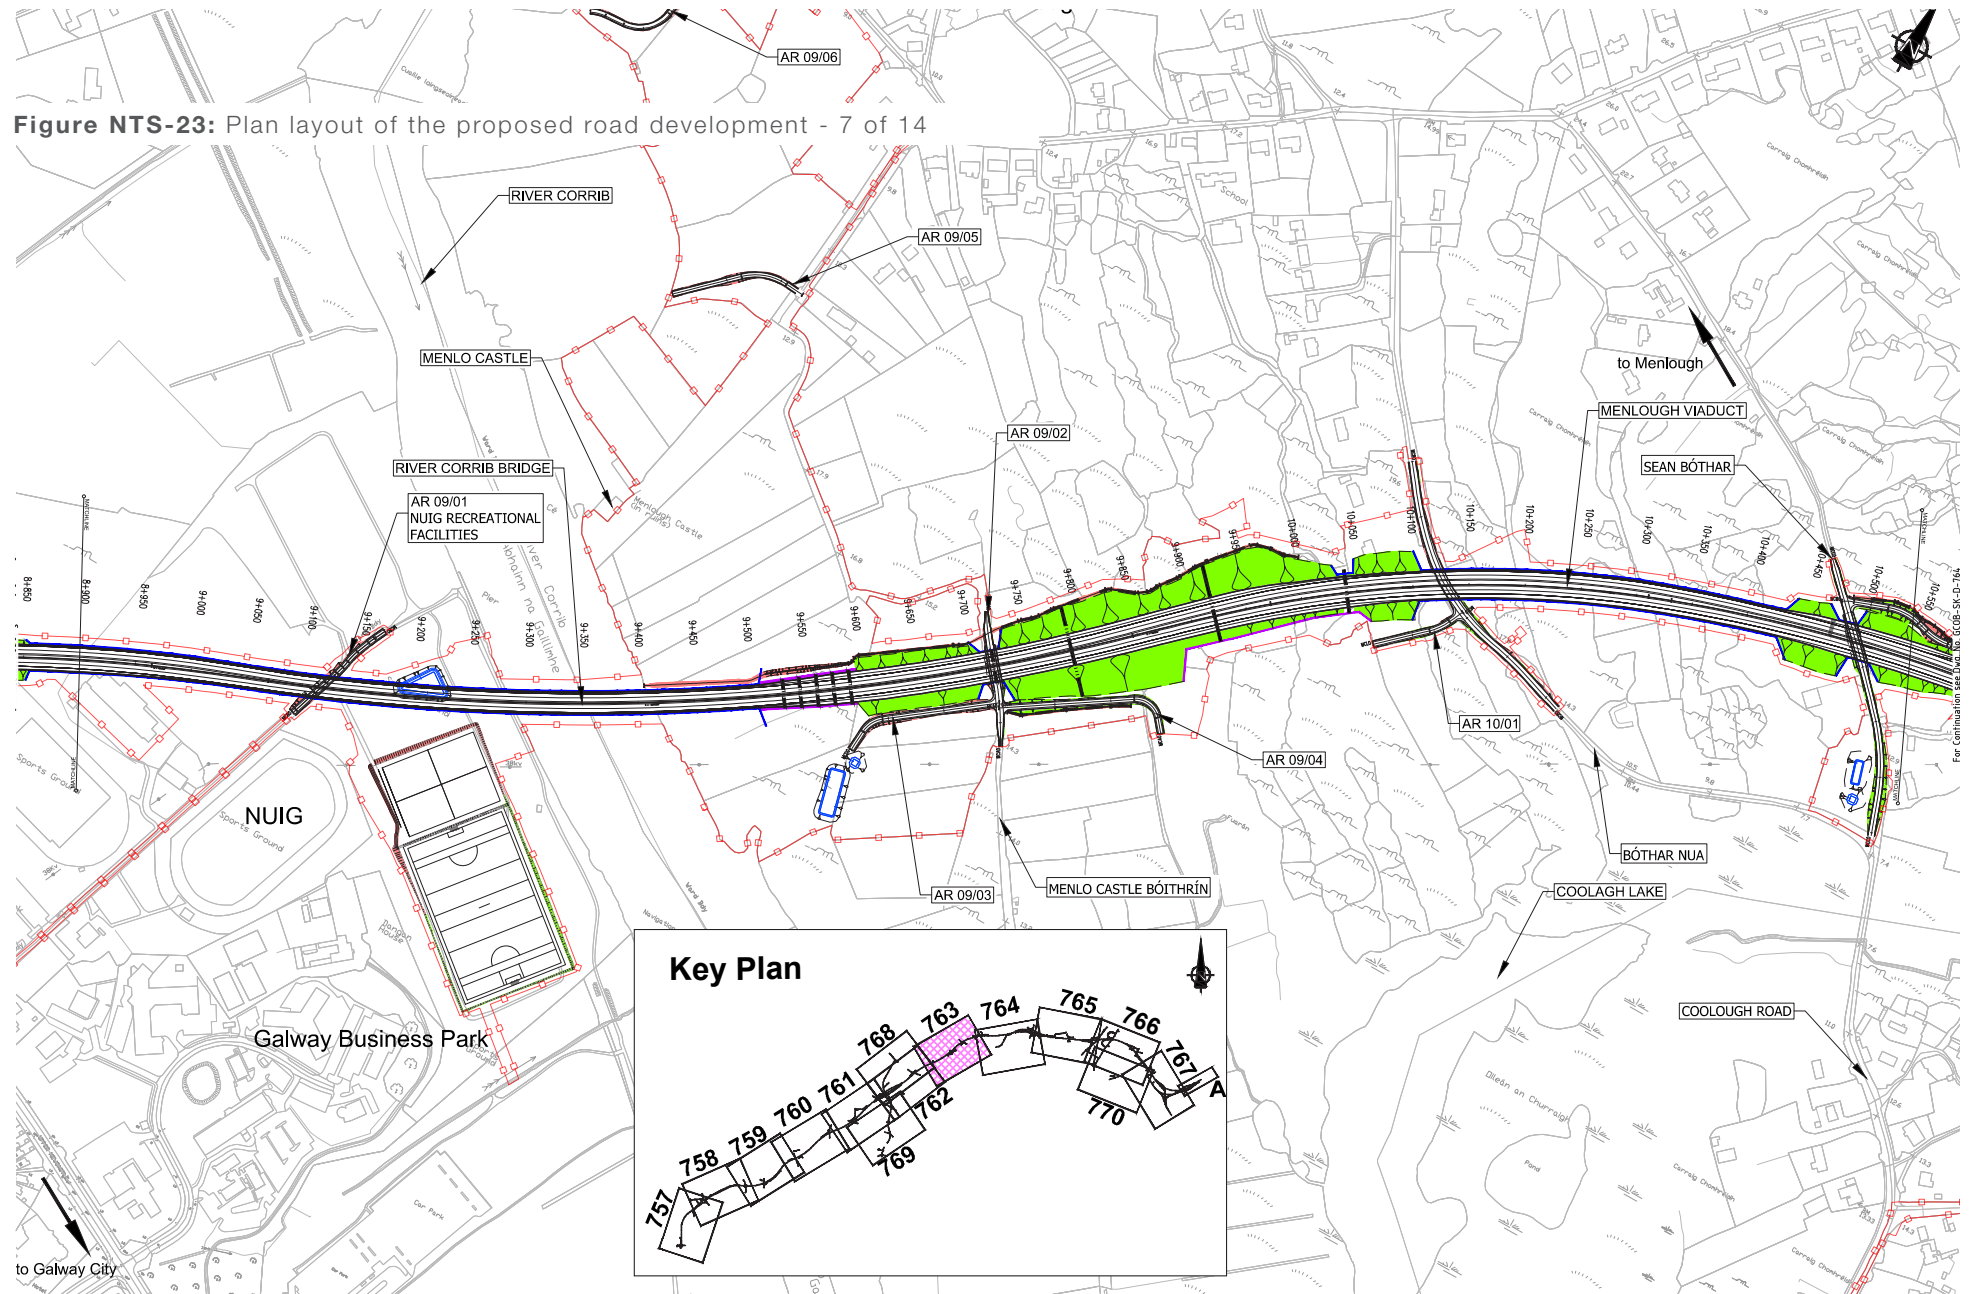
Plan layout of the proposed road development - 7 of 14
